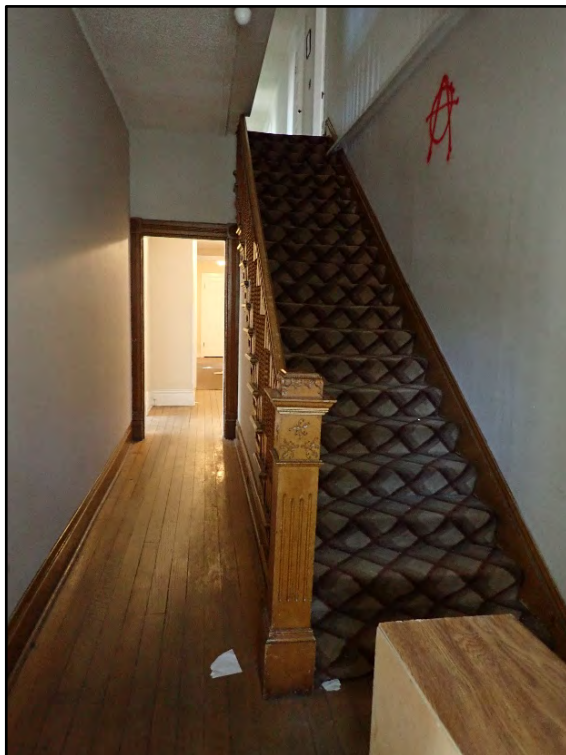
Overview of the entrance hall and main staircase to the second floor.
